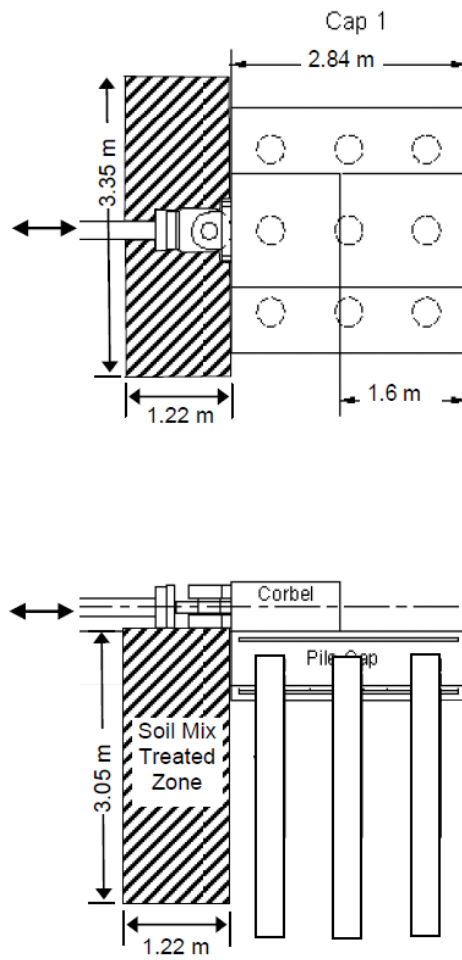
Plan and profile drawings of pile groups with soil mixed treated wall on one side (Rollins et al., 2010)
